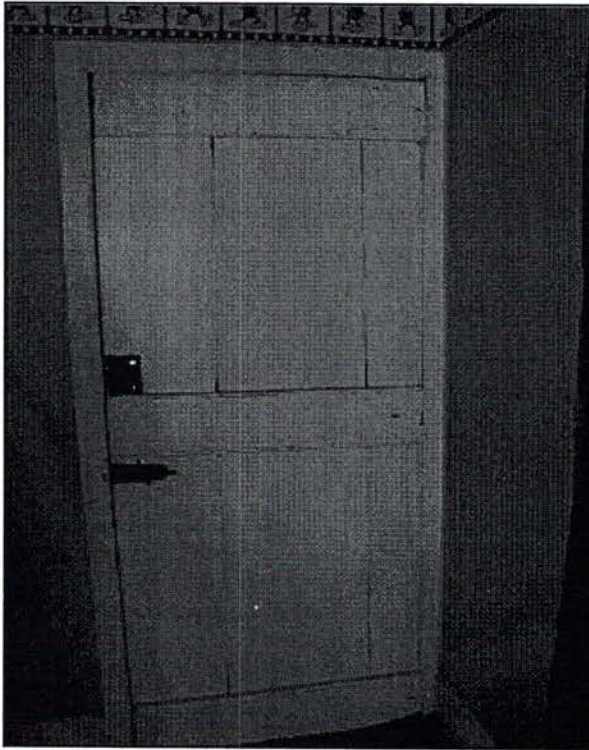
Recycled, hand planed, board and batton door in Room 207 (closed).
